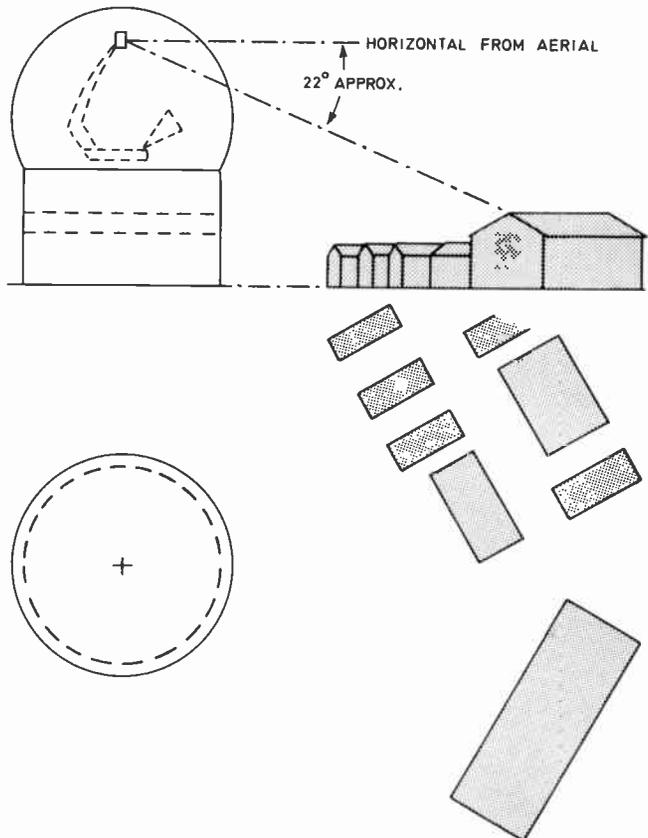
Building around radar site—elevation and plan schematics (not to scale).
